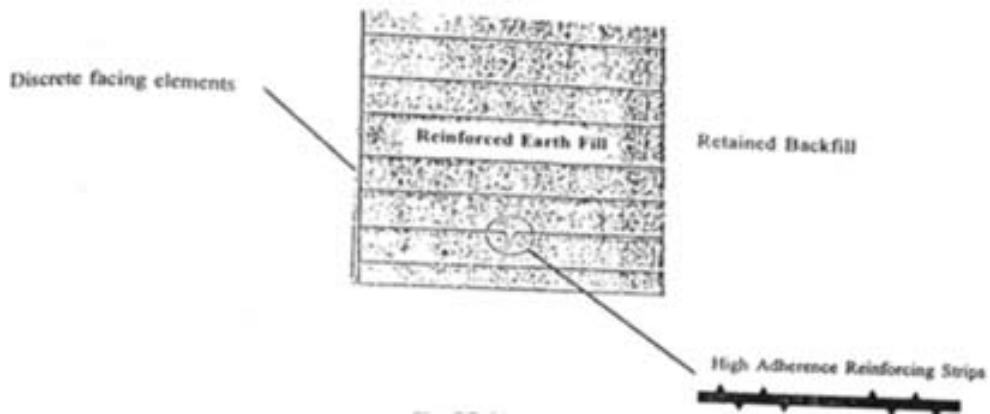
A: Basic concepts forming a Reinforced Earth Structure
